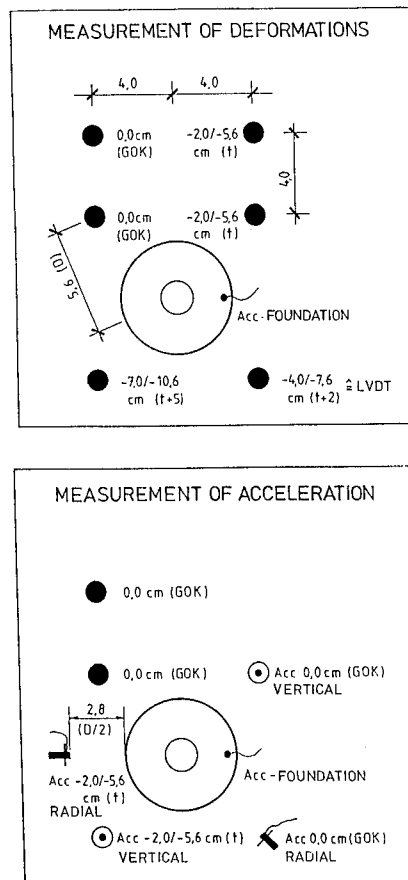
Plan view of an observed foundation with the indication of the measuring points
